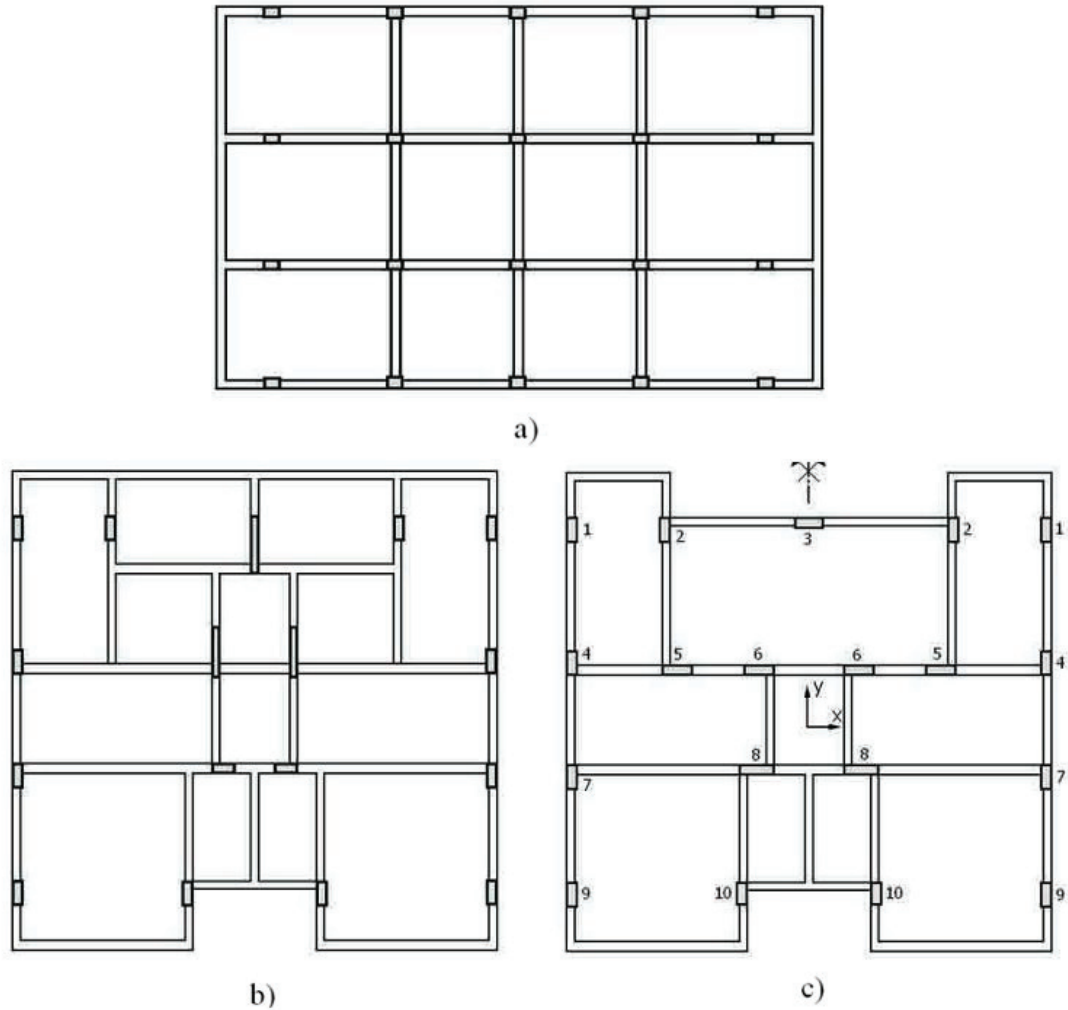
Schematical Floor Plans a) Type1 b) Type 2 c) Type 3
